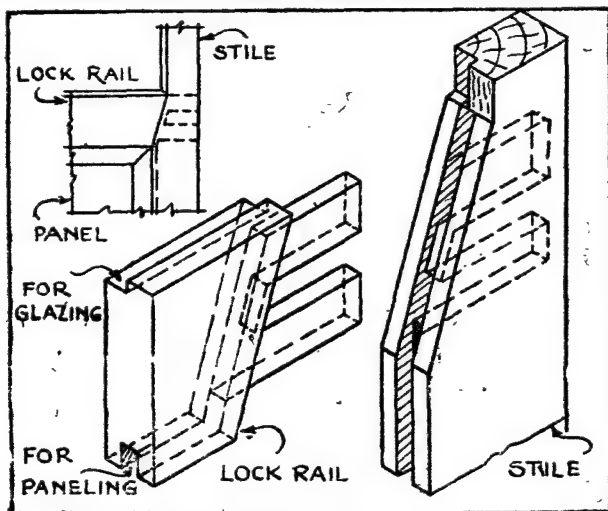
, and 283 Framing joints for lock rail and diminished stile.
